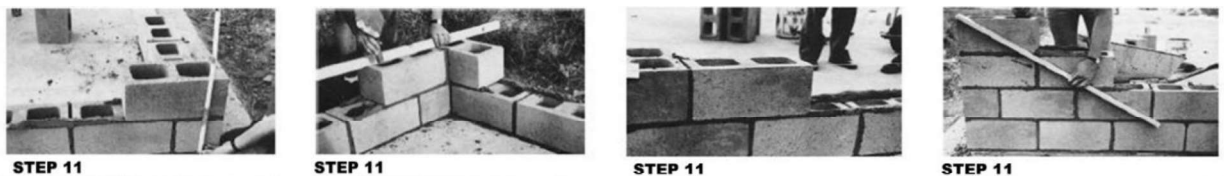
Concrete Masonry Units Steps. Source: CMA (2007)
